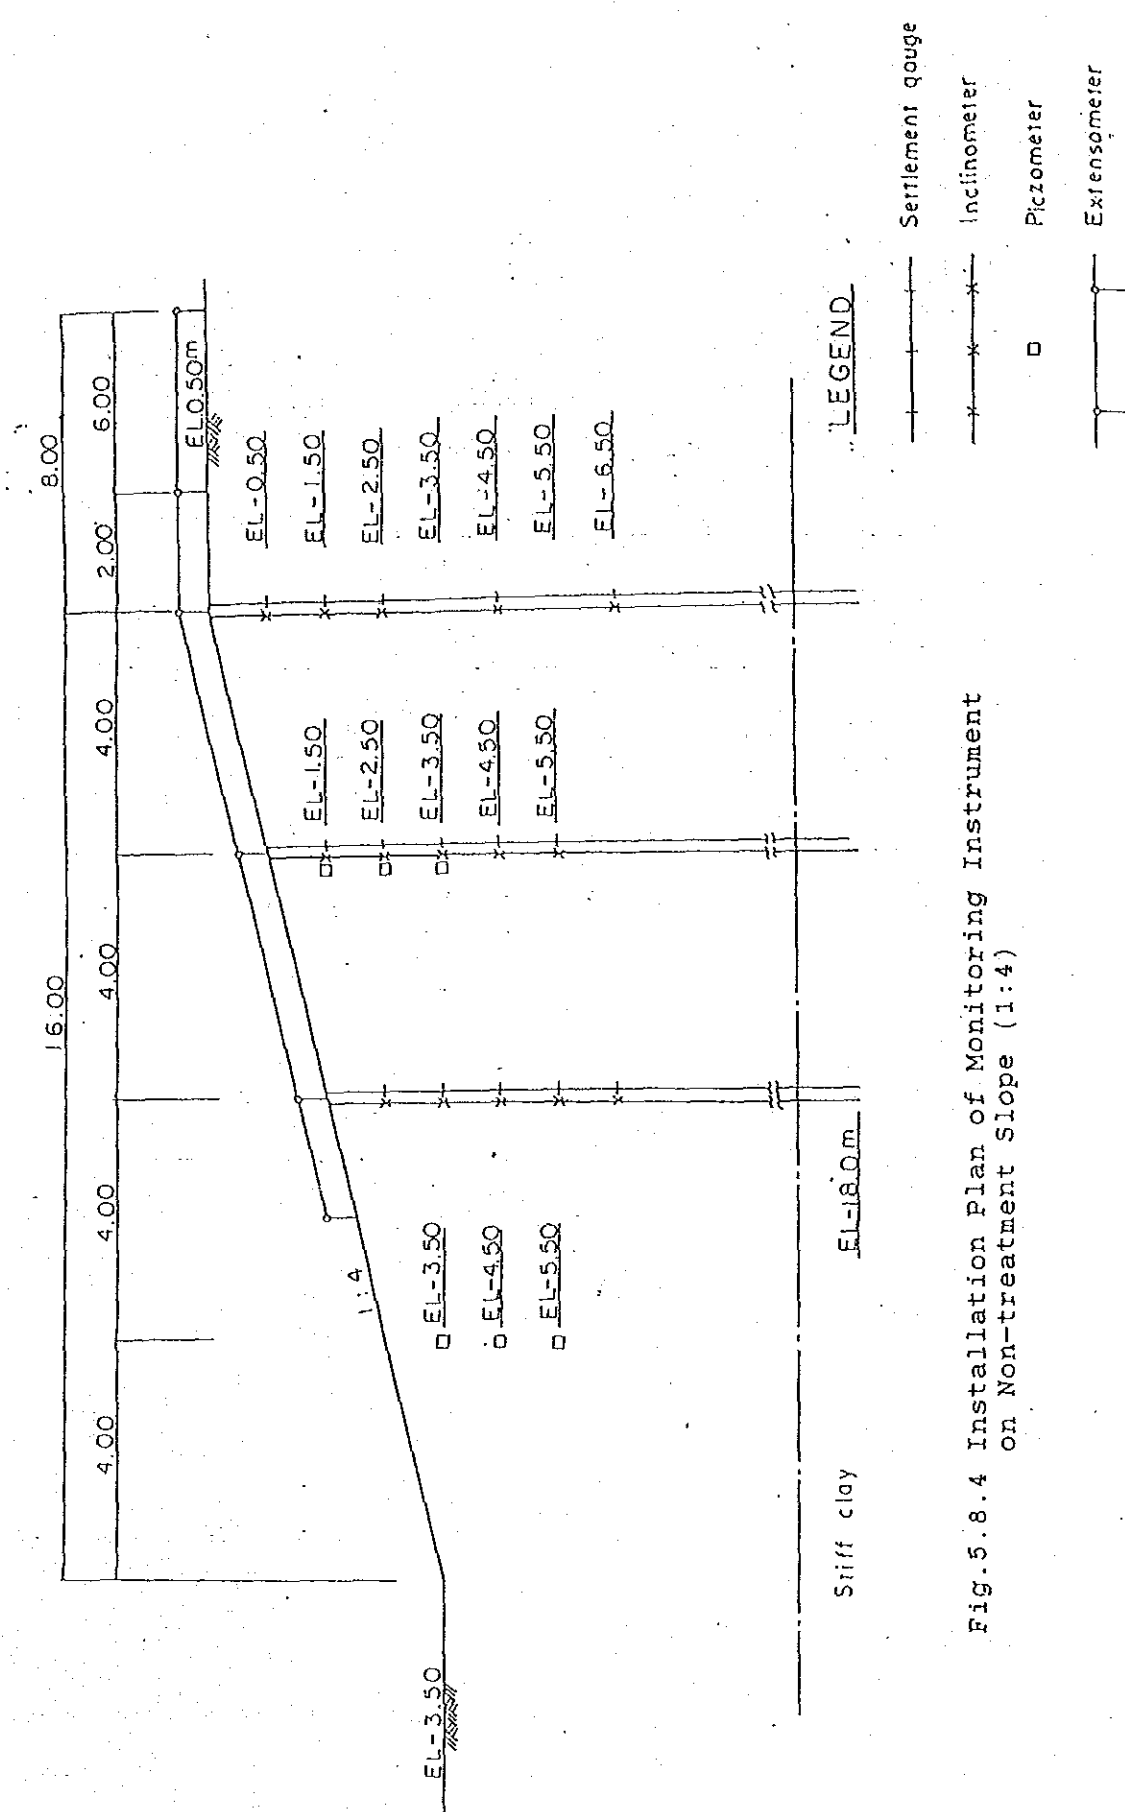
Installation Plan of Monitoring Instrument on Non-treatment Slope (1:4)
